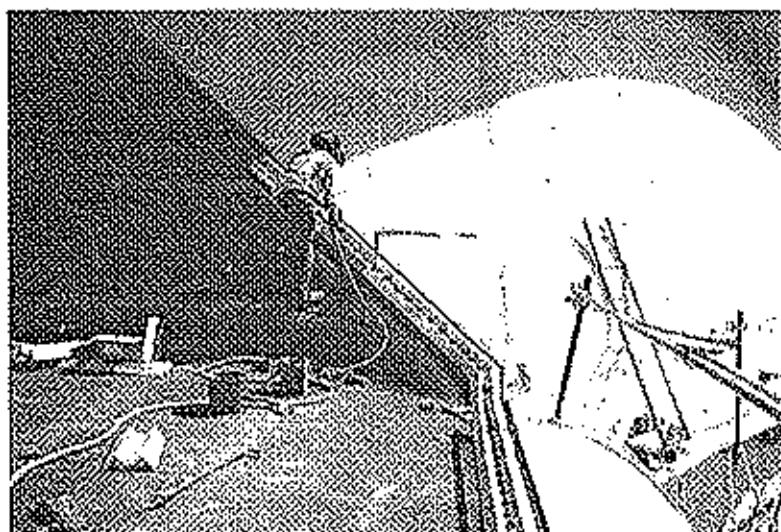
a.: Tighten Anchor Bolt Nuts
